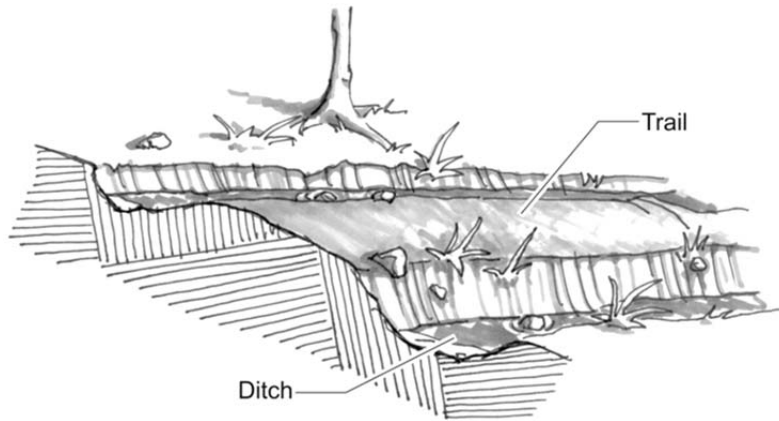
Slot Trench Drains and Elevated Trail Tread
